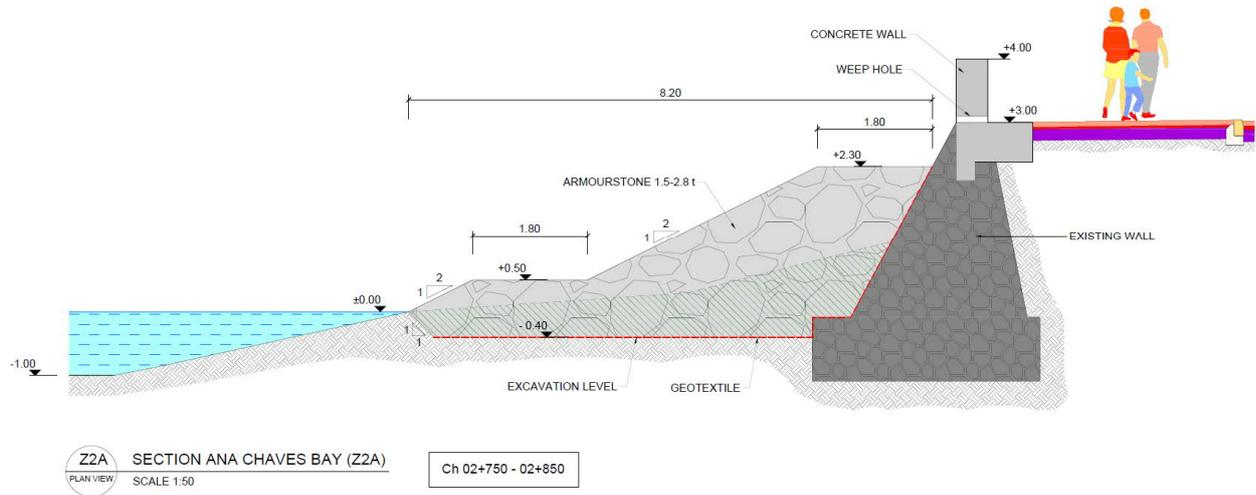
Typical cross section Z2A. Ana Chaves Bay
